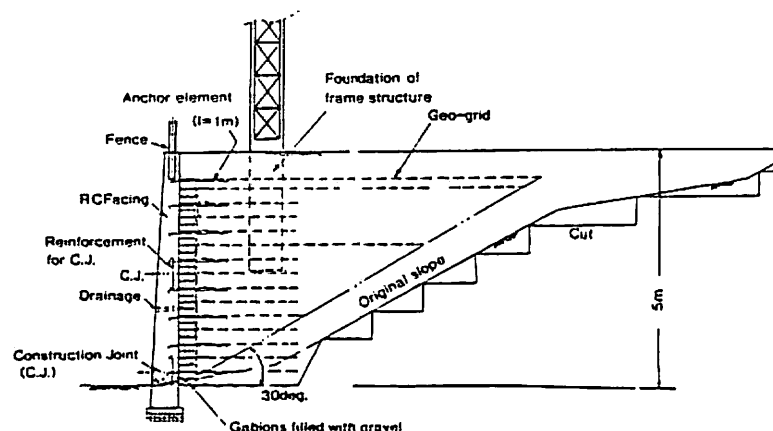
Cross-section of geosynthetic-reinforced soil retaining wall with a slightly inclined wall face at Shinkansenyard, Nagoya (Tatsuoka et al., 1992).
